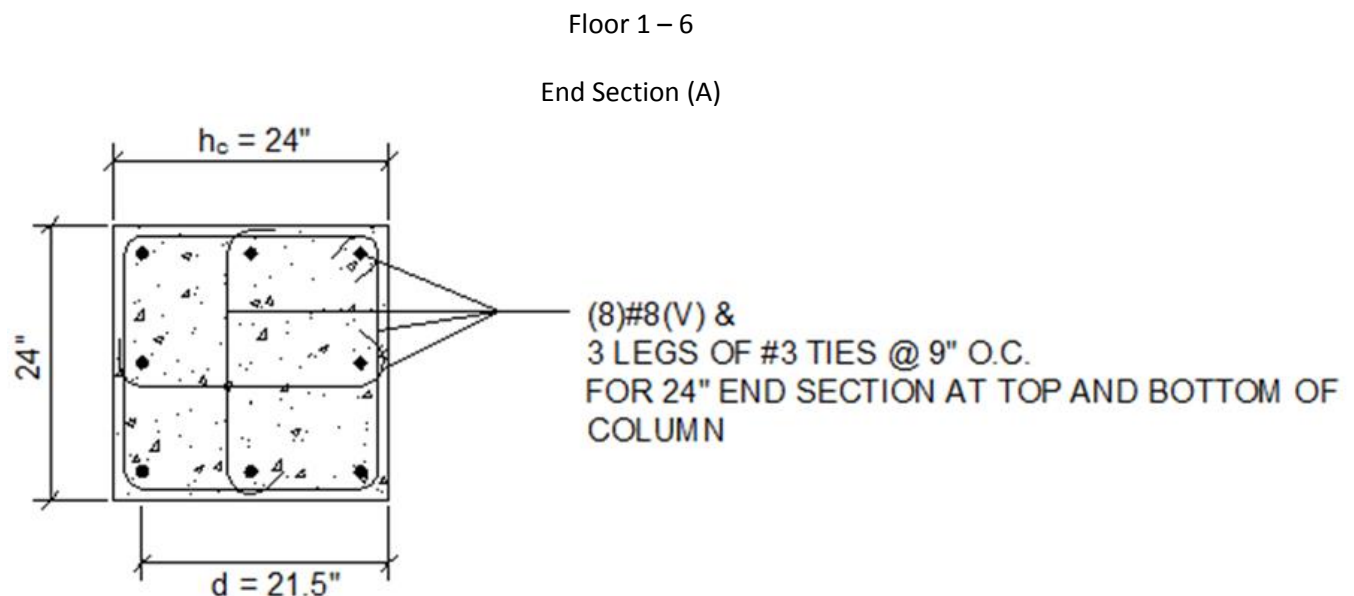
Exterior column, cross-section at end of column at all floor level based on SDC C design.
